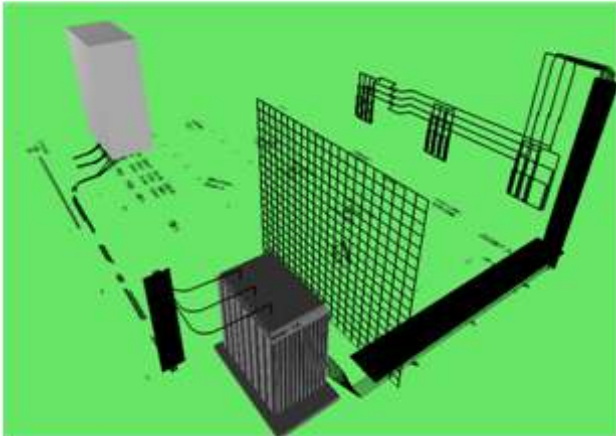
3D view of the model of a MV/LV transformer station located in the ground floor of a building
